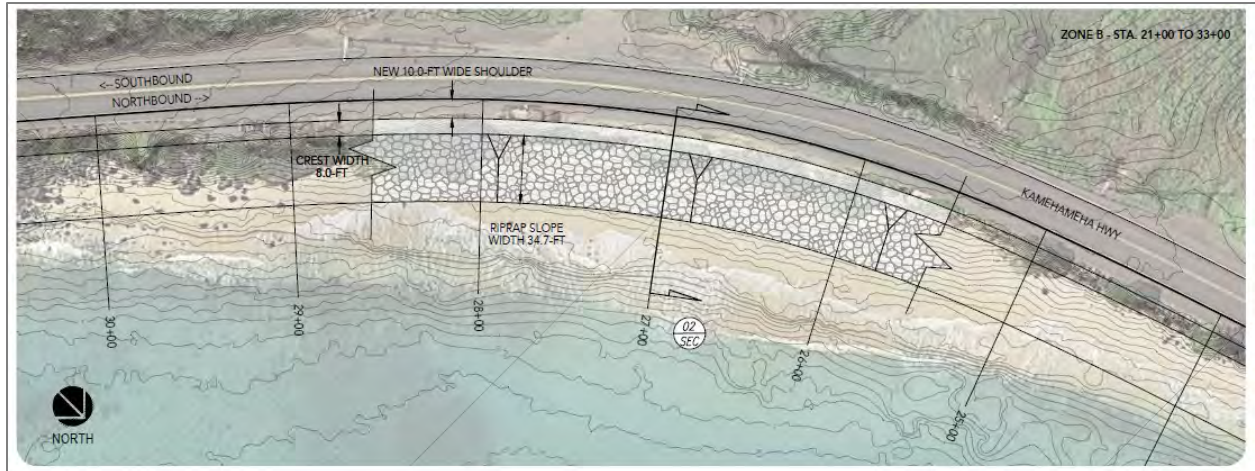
Plan view concept drawing of a proposed rock revetment structure.
